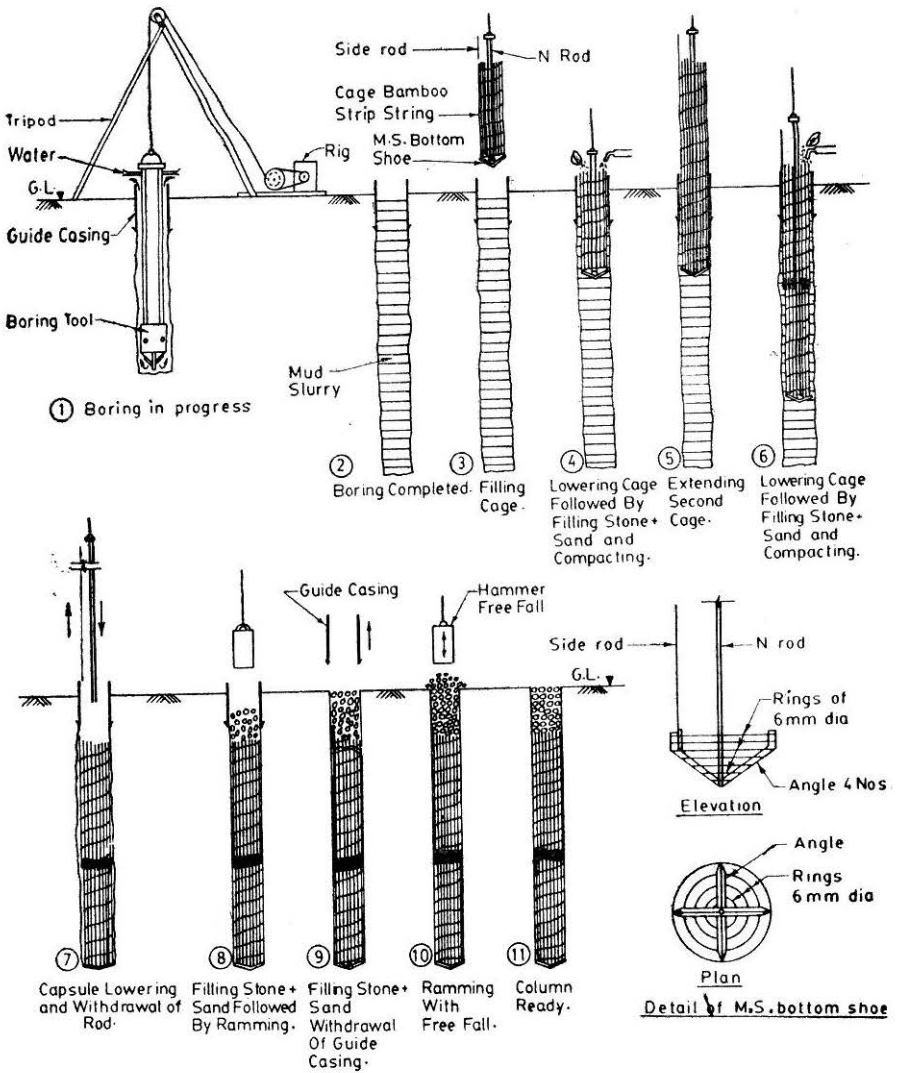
Installation of stone column through uncased bore hole over ground placement with special shoe
